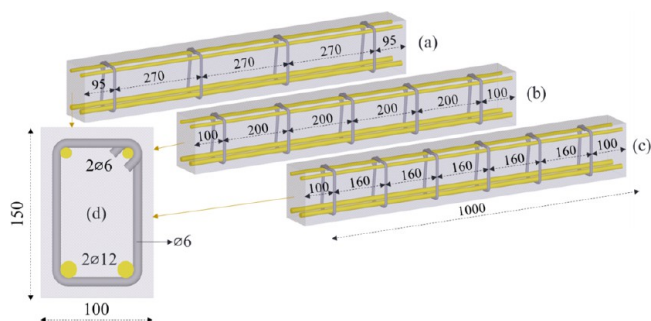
Reinforcement layout for samples with spacing of stirrup of (a) 270 mm, (b) 200 mm, and (c) 160 mm.
